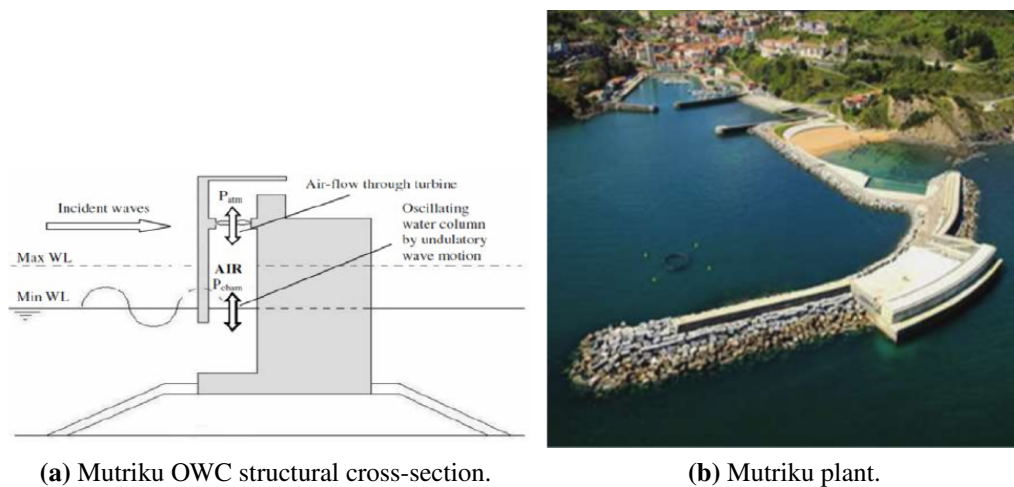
Mutriku plant, cross-section and general view. Extracted from [13].
